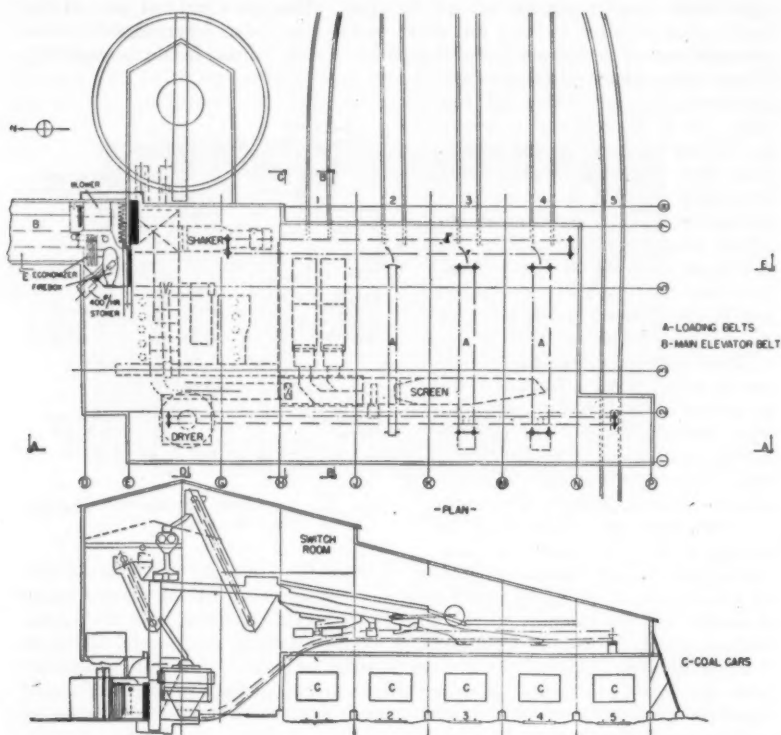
FLOOR PLAN AND ELEVATION SHOWING ARRANGEMENT OF HEATING PLANT FOR COAL TIPPLE
